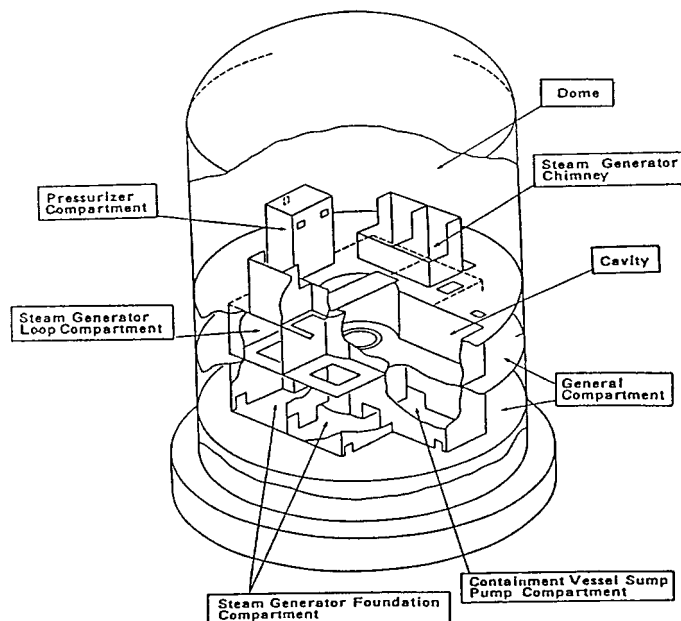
NUPEC 1/4-Scale Containment Mixing Facility [1]
